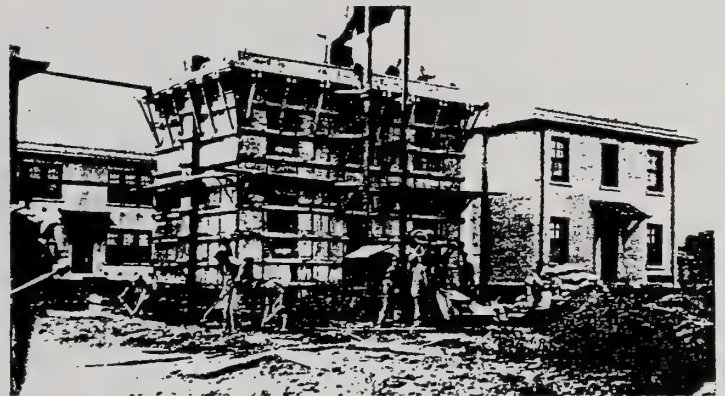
Thomas A. Edison's Cast-in-Place Houses, Union Township, New Jersey (1909). This construction photo shows the formwork for the cast-in-place reinforced concrete houses built as low-cost housing using a standard 25- by 30-foot module. Photo: Edison National Historical Site.
